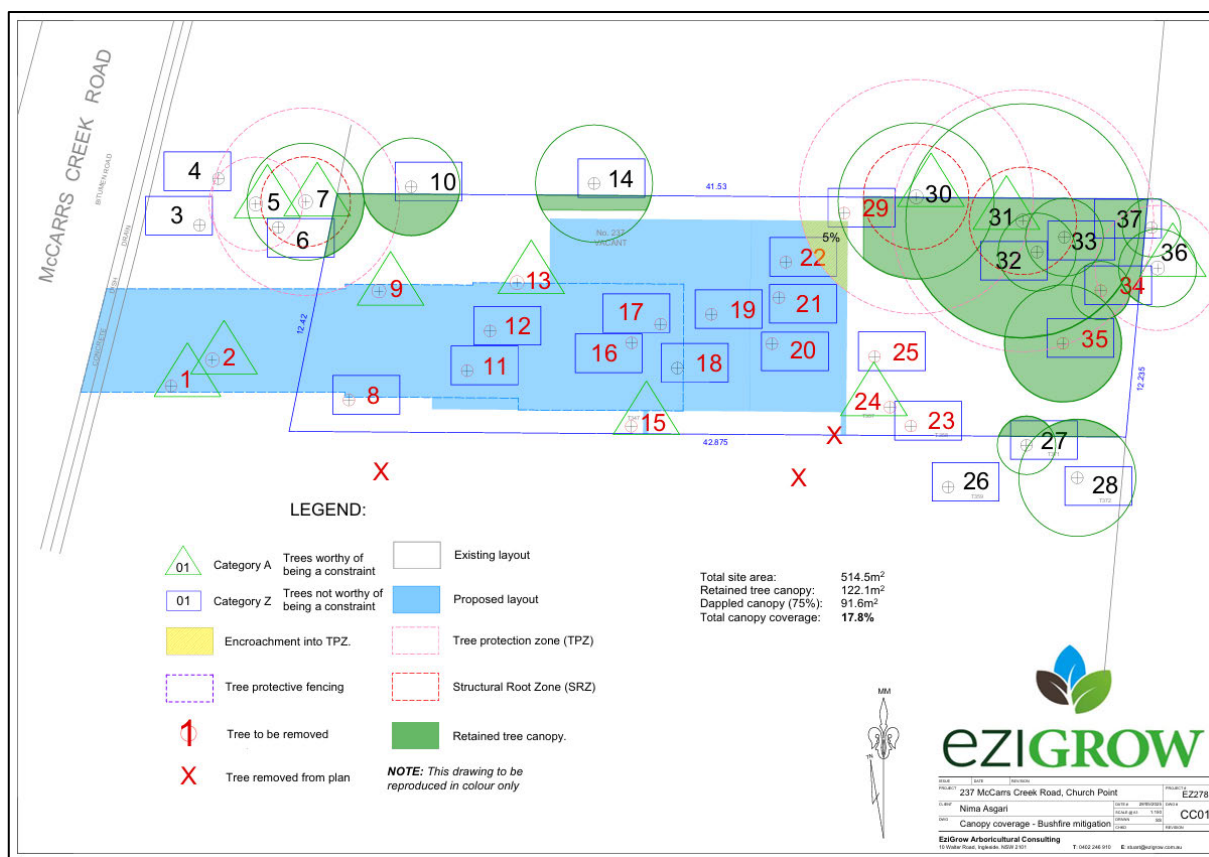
Proposed tree removal plan (Ezigrow, 2025)
